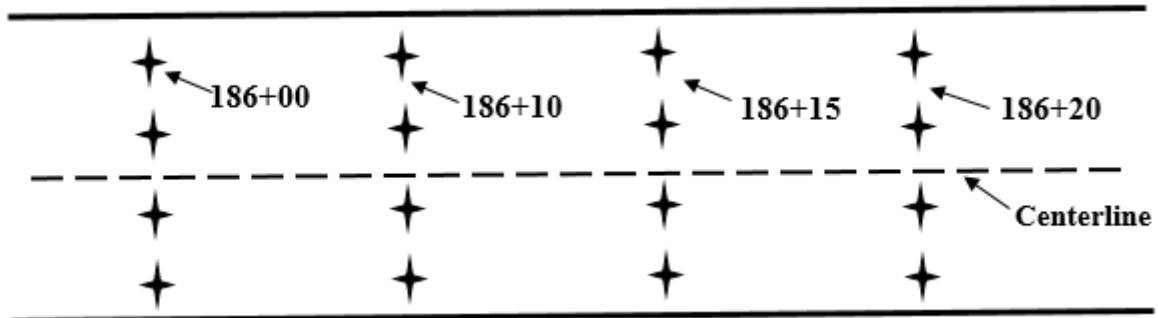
Clines Corners Clegg Hammer testing schematic for base
